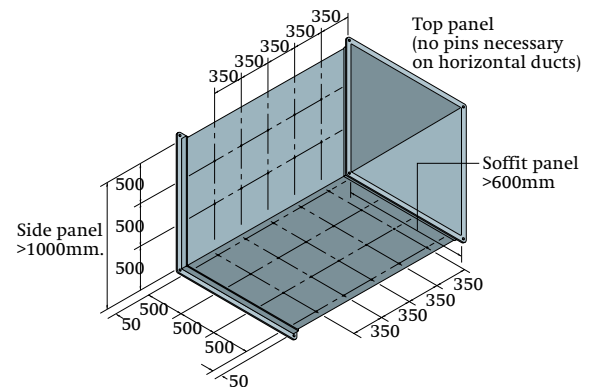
Steel pin arrangement where side panel is greater than 1000mm or soffit panel is greater than 600mm
